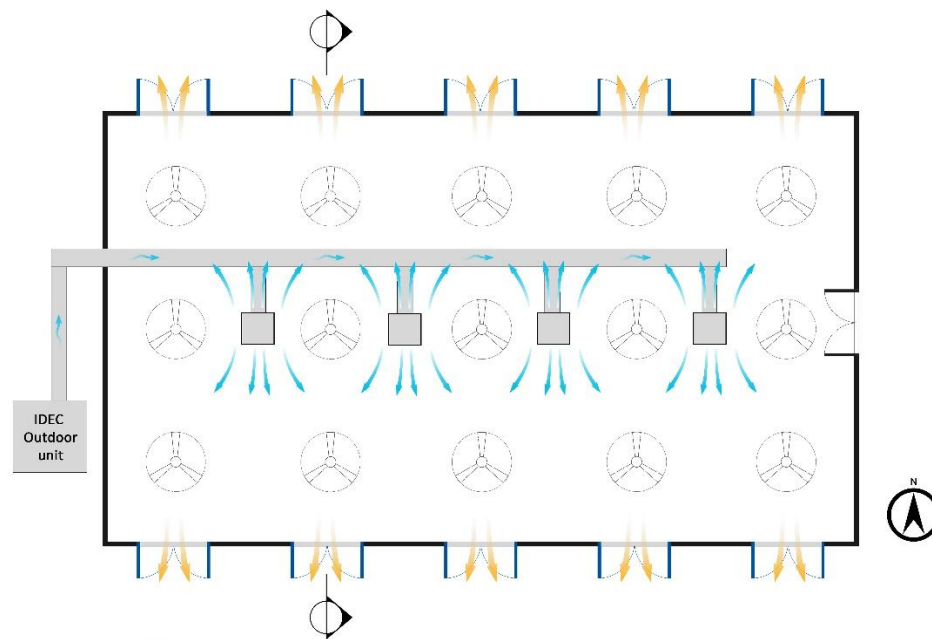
Conceptual plan showing layout of the cooling system for IDEC system in a cooling center (temporary structure)
